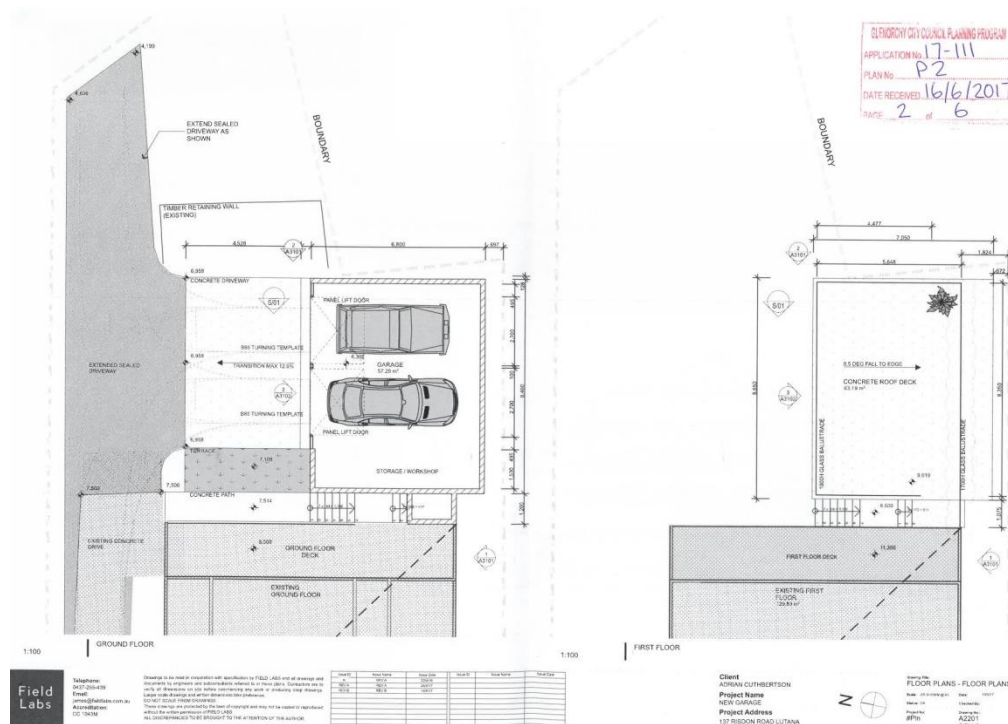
Site Plan of the backyard of 137 Risdon Road, Lutana.
